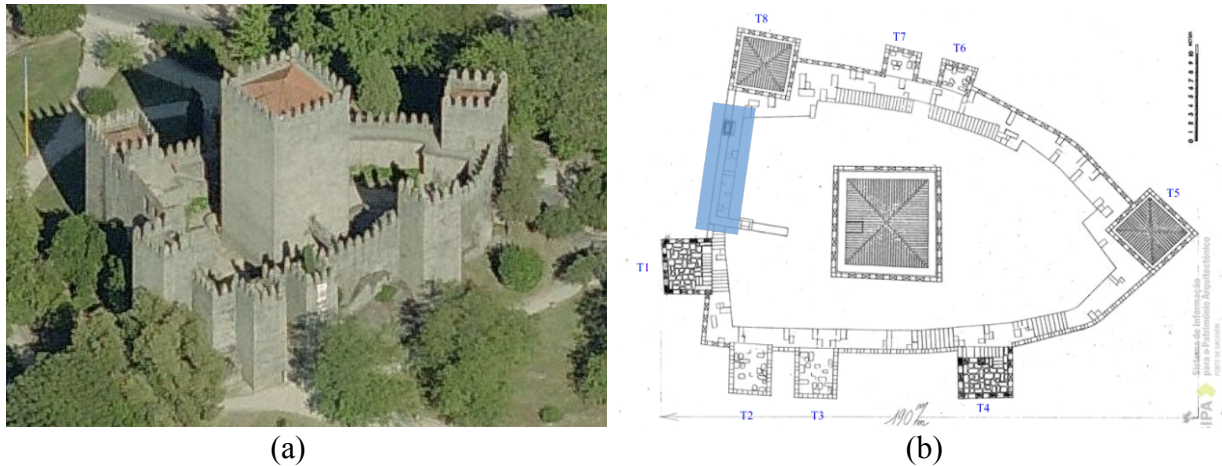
Castle of Guimarães: a) Panoramic View; b) Plan (“Alcáçova” Wall Shaded)
